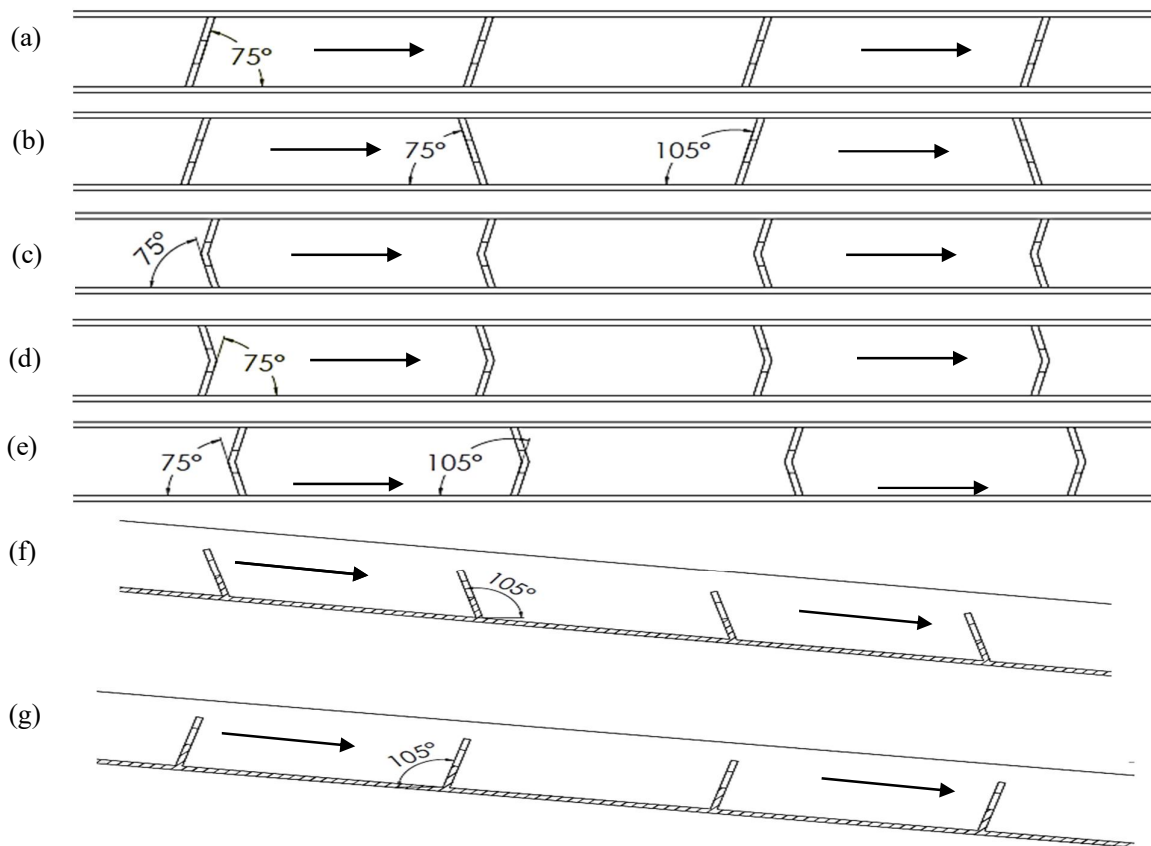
Cross-wall arrangements in design modifications (a)-(e) Plan views of the arrangements where the cross-walls are inclined 15° to the horizontal (f) and (g) Longitudinal sections of arrangements where cross-walls are inclined 15° to the vertical
